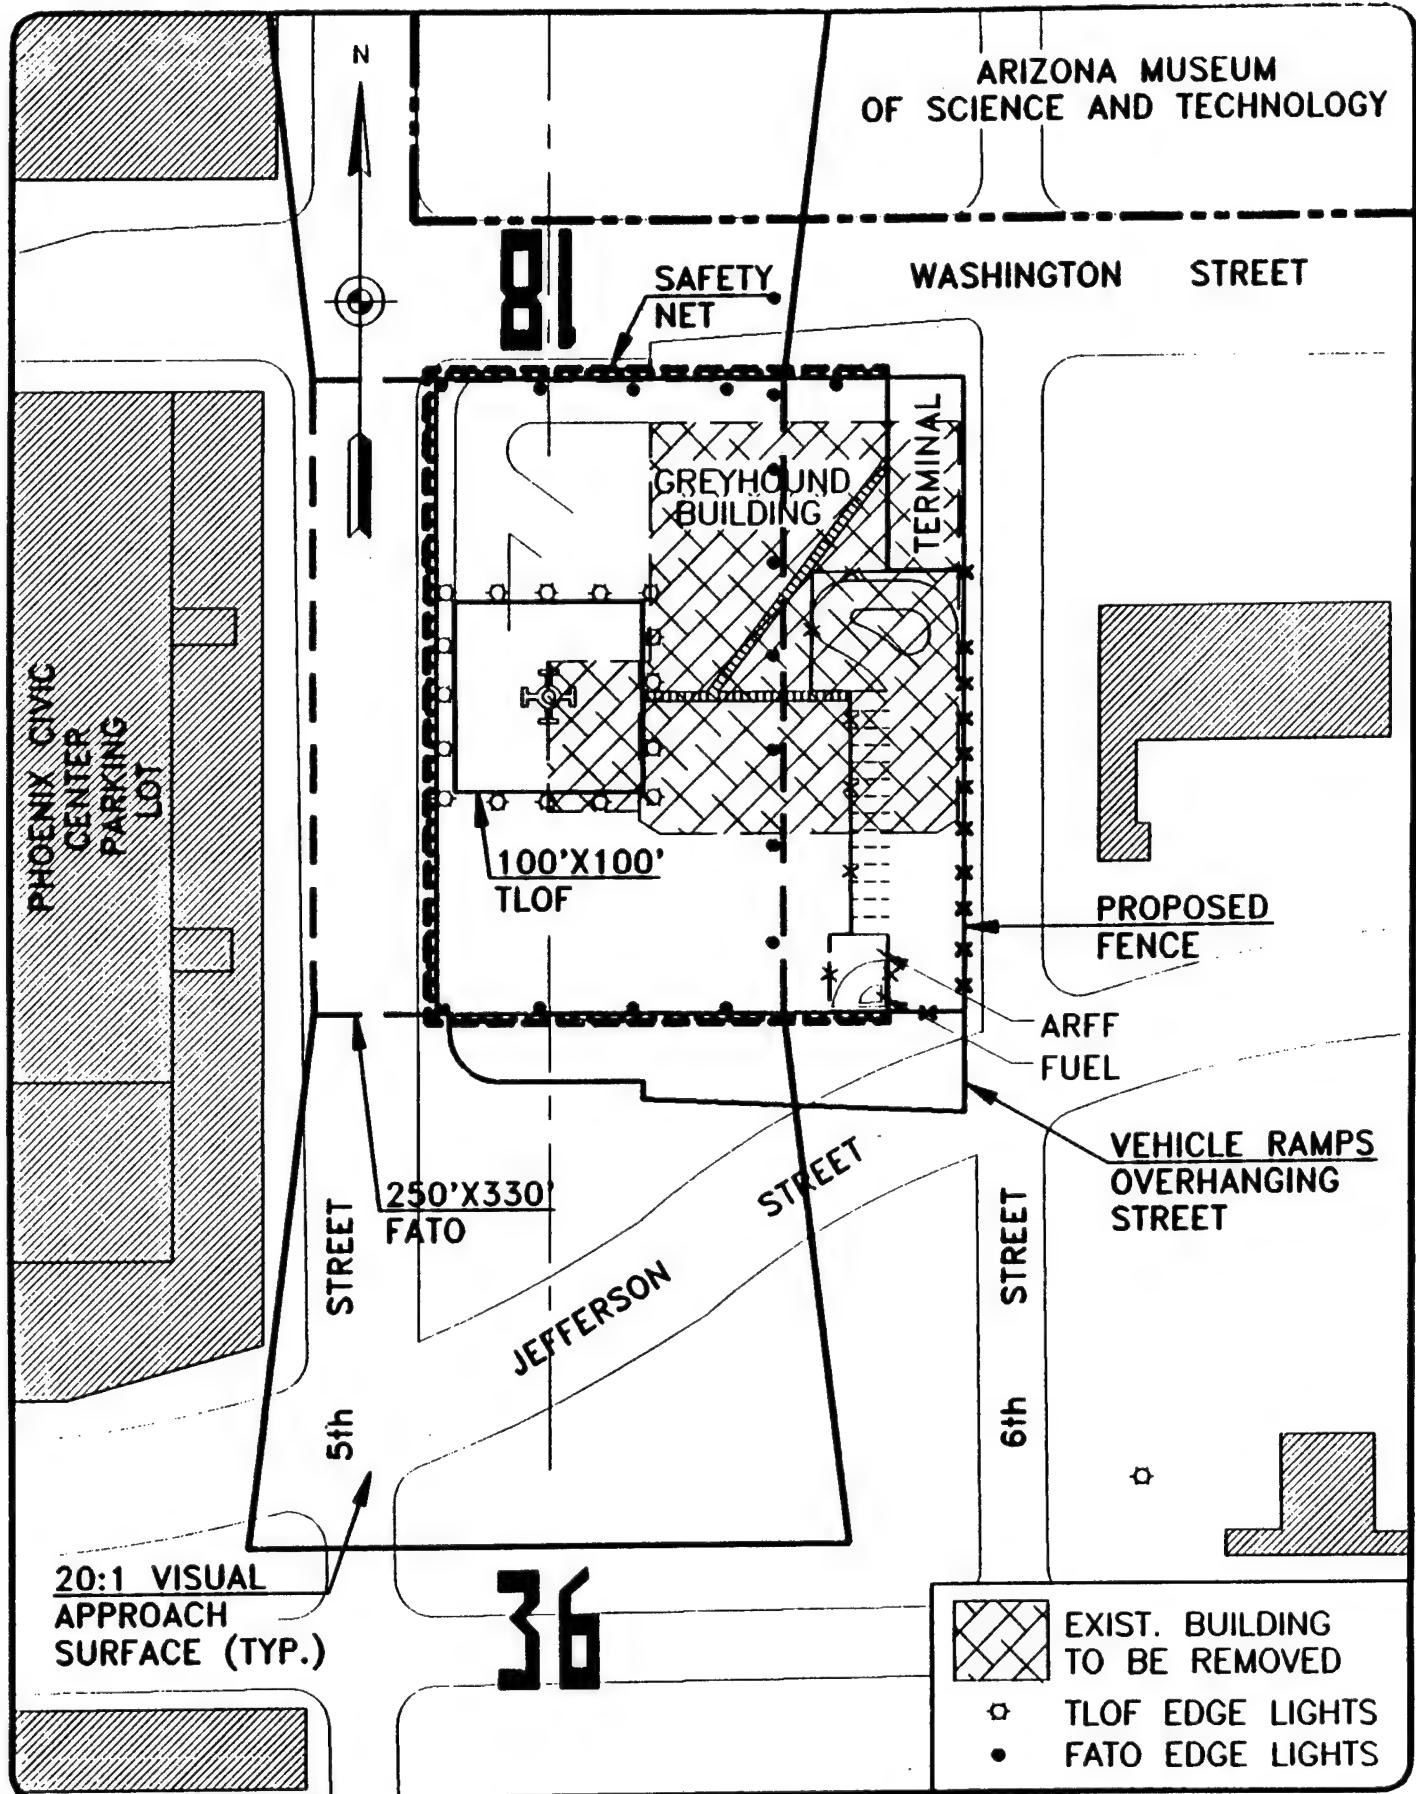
SITE PLAN - GREYHOUND PARKING GARAGE,
